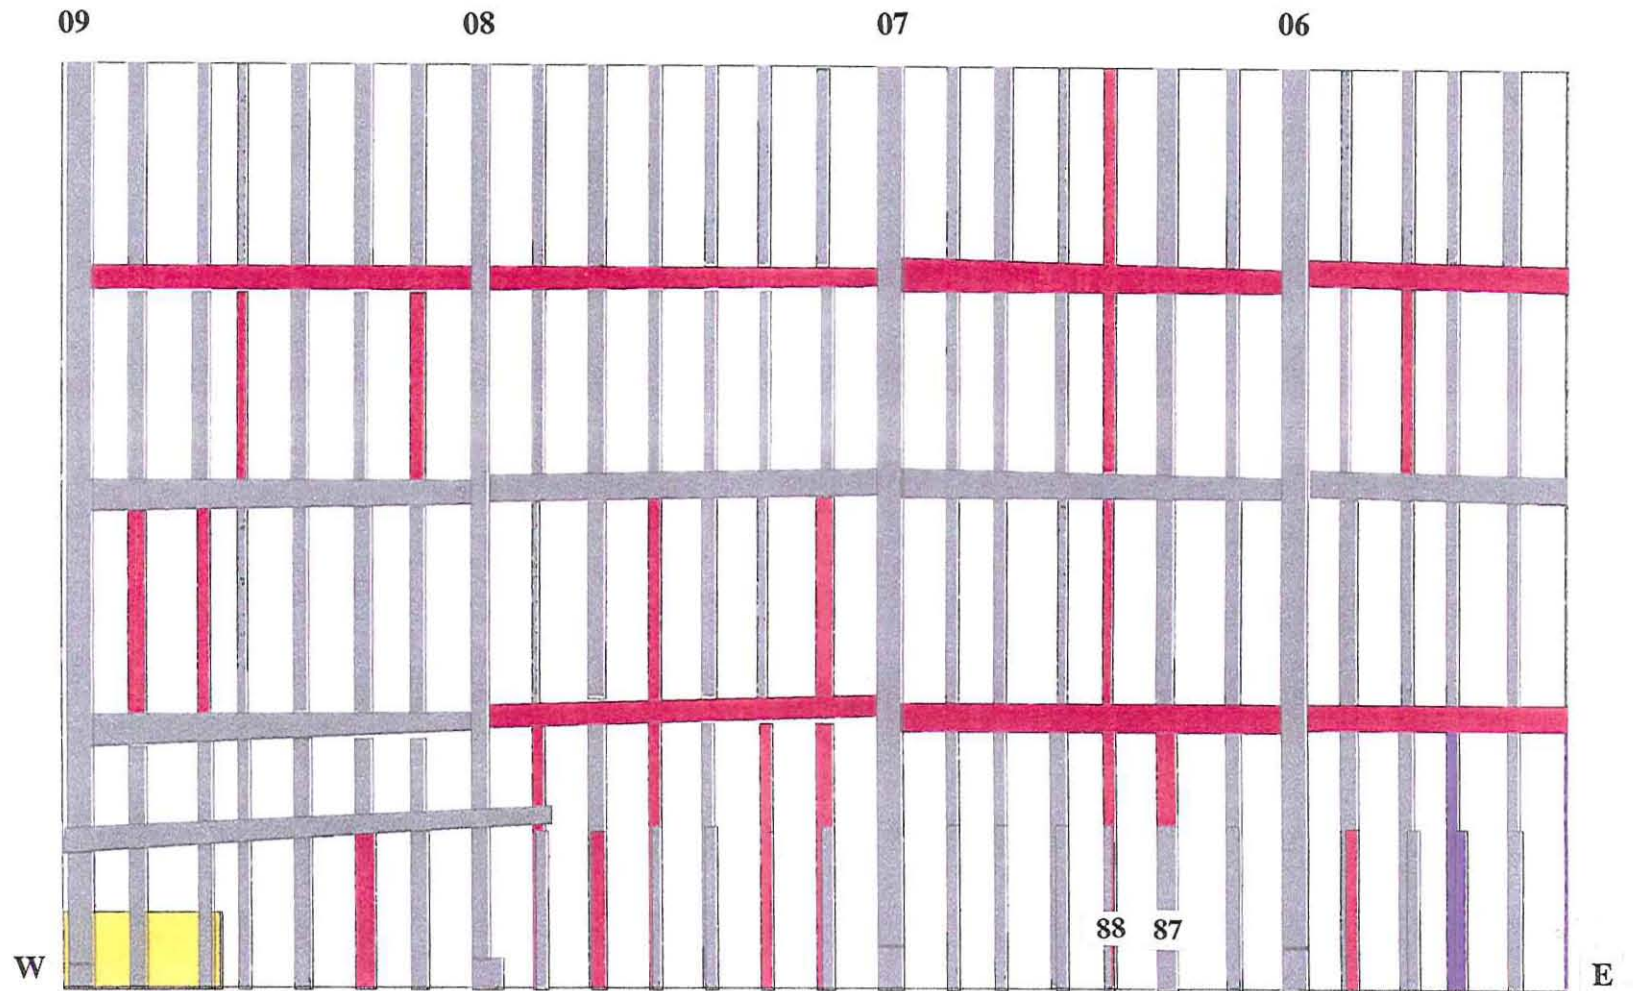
(2): North elevation of choir roof (eastern half) to show sample locations
